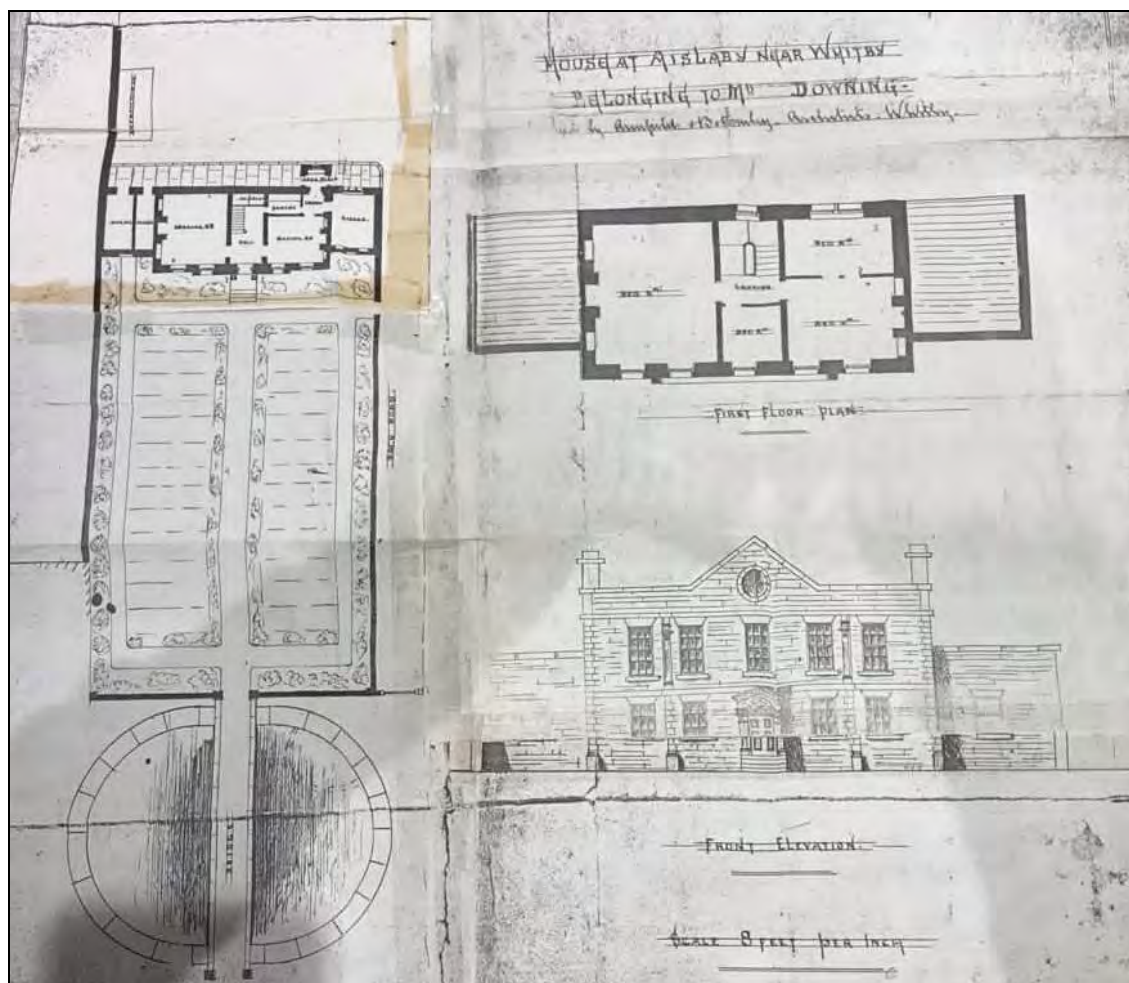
Historic drawing of floor plans, front elevation and garden of The Pond House (date unknown)
